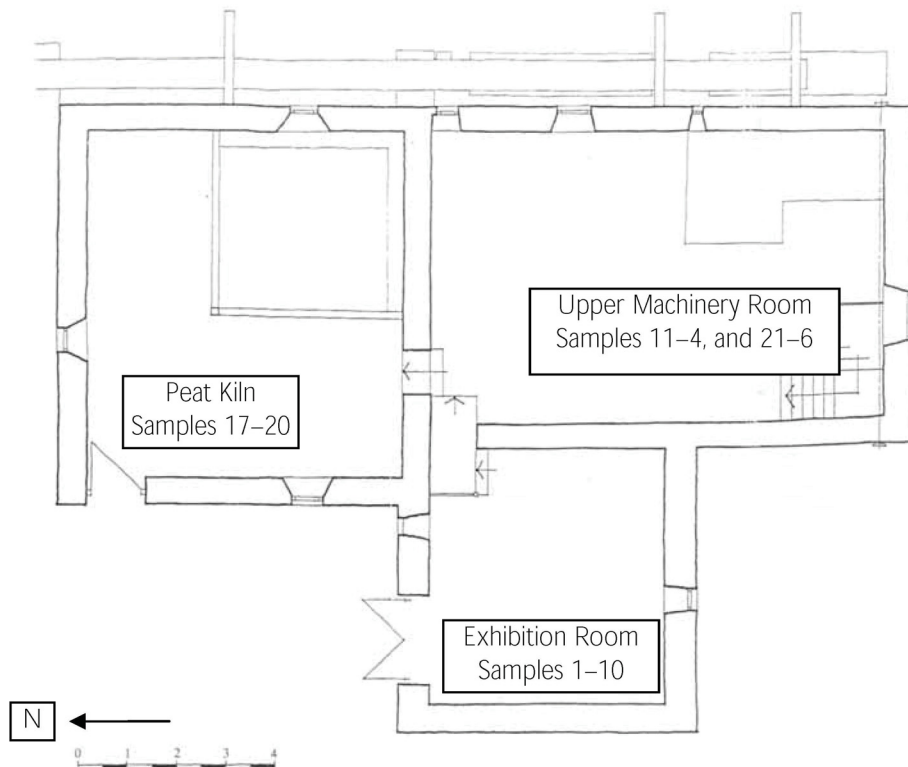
Eskdale Mill, Boot. First-floor plan. Drawing with permission from David King, Eskdale Mill and Heritage Trust
